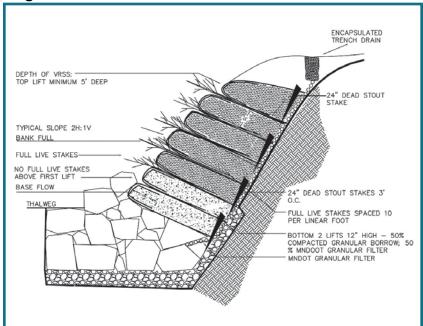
Vegetated reinforced soil stabilization detail, cross-section, not to
